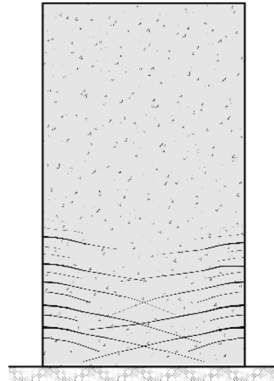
Elevation view of a RC wall with plastic hinge at the base.
